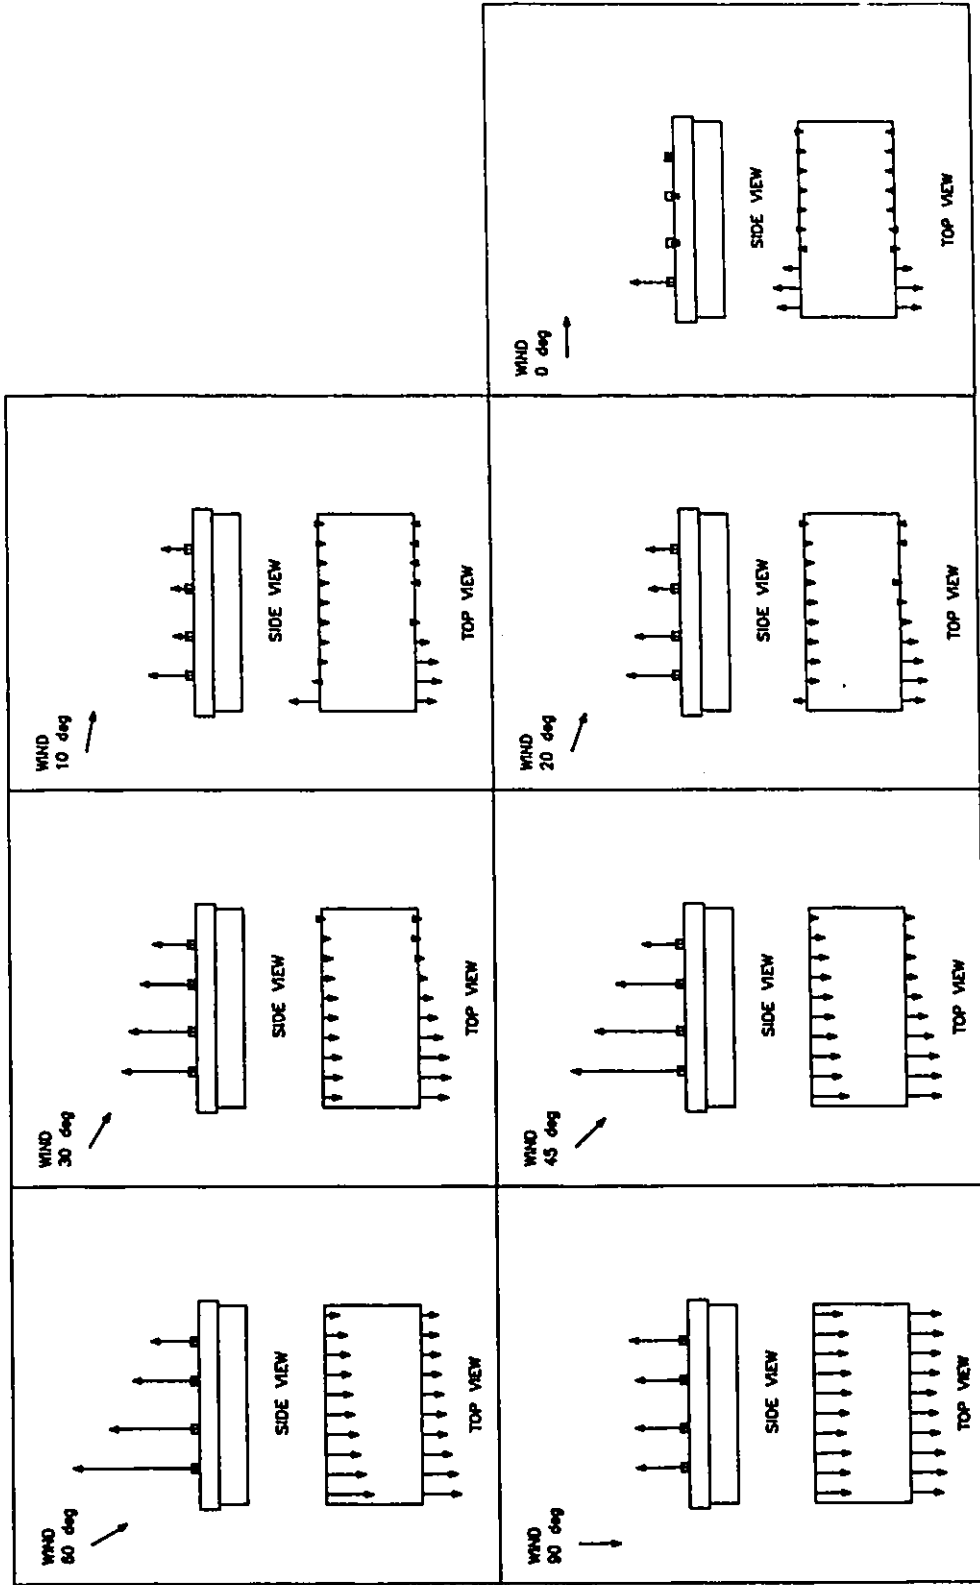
ΔC_p s (in-out): sealed model, chimney, simulated 1100 mm sidewall openings, closed end walls, 7 wind angles of incidence. 420
